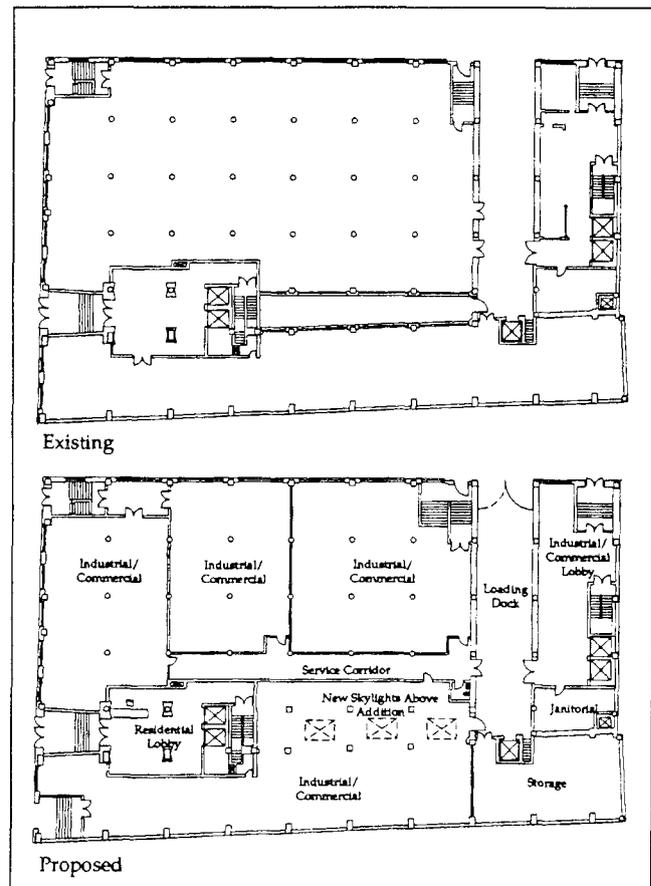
Ground Floor of Mayor Building—Existing (Top) and Proposed (Bottom) Plans
